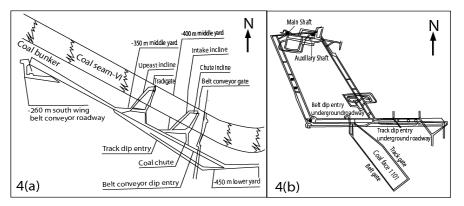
(a) Road way arrangement of the Barapukuria coal mine, NW Bangladesh (CMC, 1999); (b) The development plan of the road way and 1101 coal face tunnel of the BCM (CMC, 2003).
